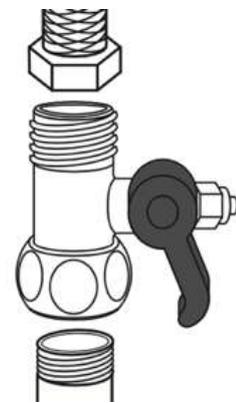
An example of mounting a t-bend with a ball valve into a gap in the water supply line.
